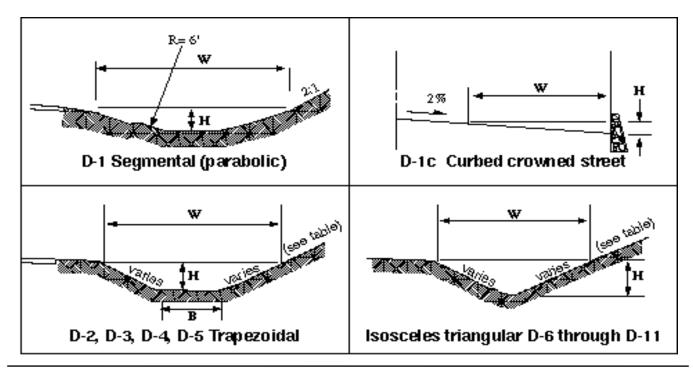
D DRAINAGE DITCHES — COMMON SECTIONS
